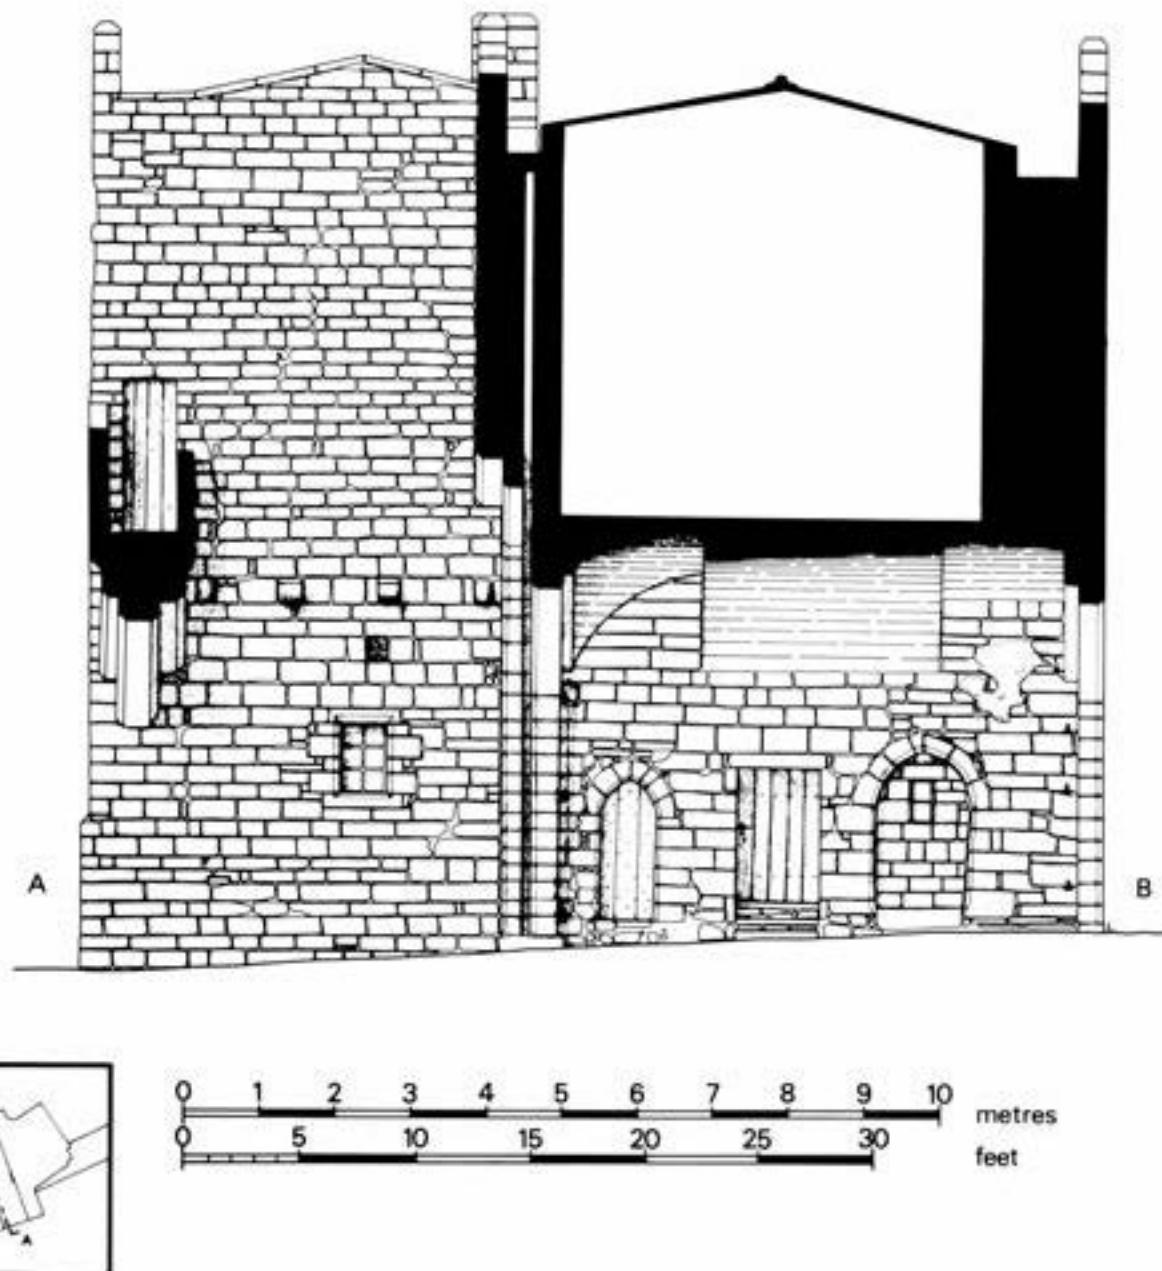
The outer gatehouse; north-south elevation of the west side of the gate passage
